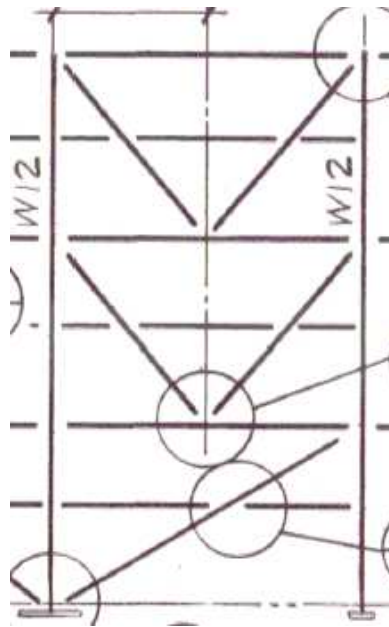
Frame Elevation (86WA3A--10-HF-1)
